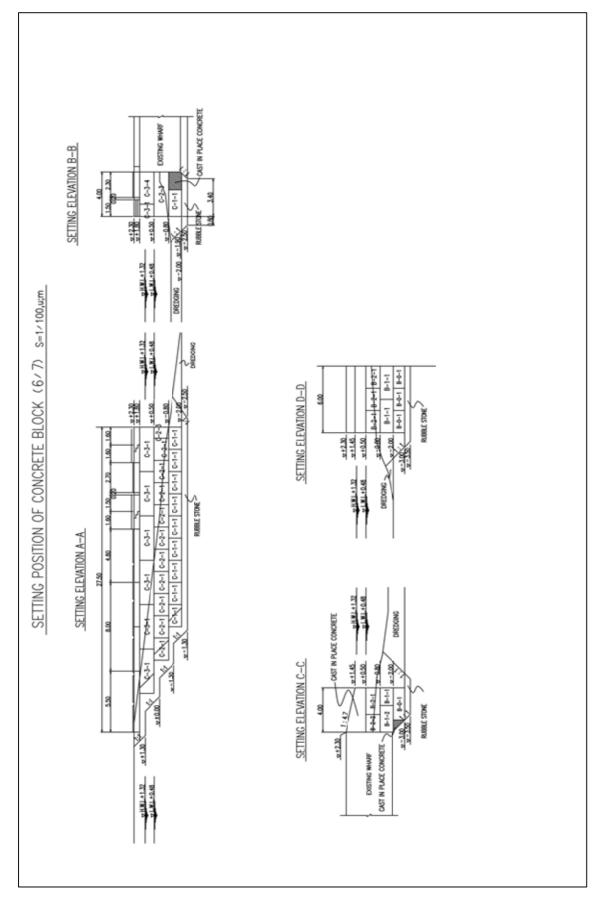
Setting Position of Concrete Block (Elevation Plan of Eastern Side)
